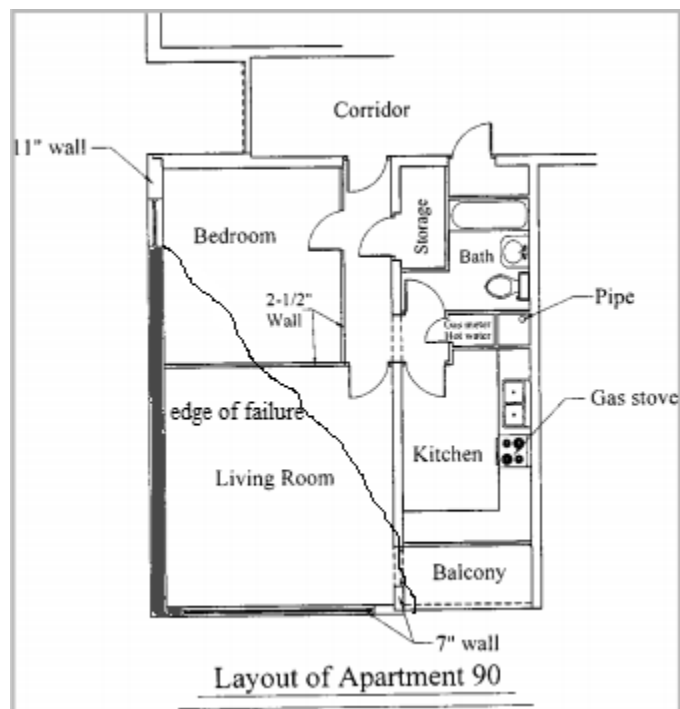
The plan of the flat at the 18<sup>th</sup> floor (failures.wikispaces.com)
